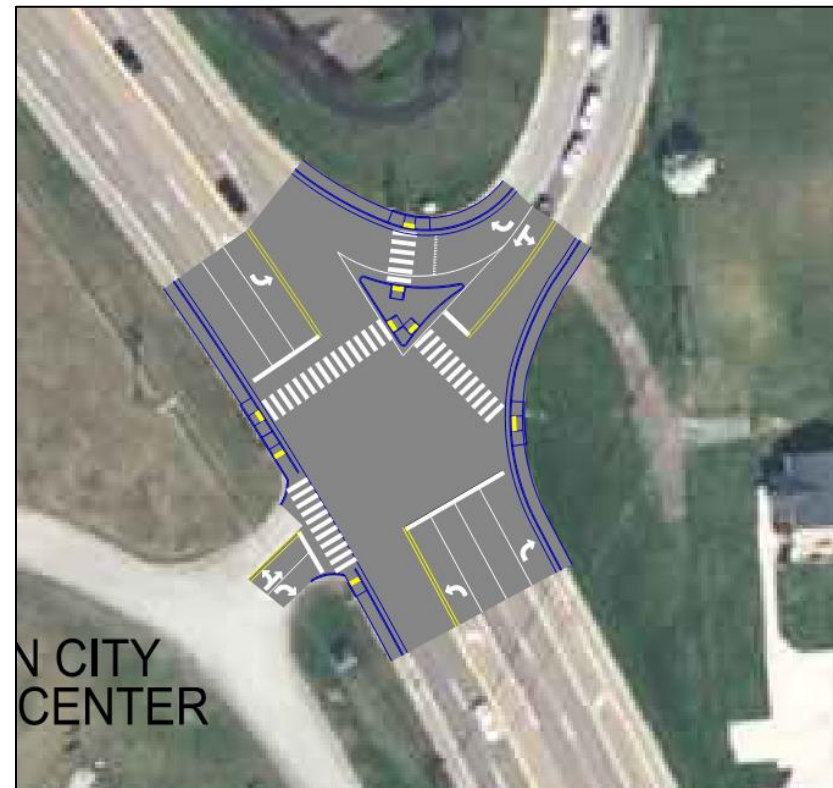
SR 92 at George Avenue Short-Term Improvement
